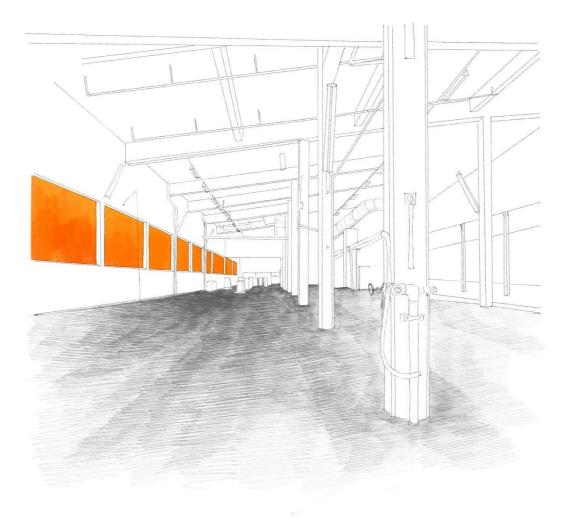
Interior sketch of storage building which had liner continuous space, Sketch: Author (Sahlberg, 2017).
